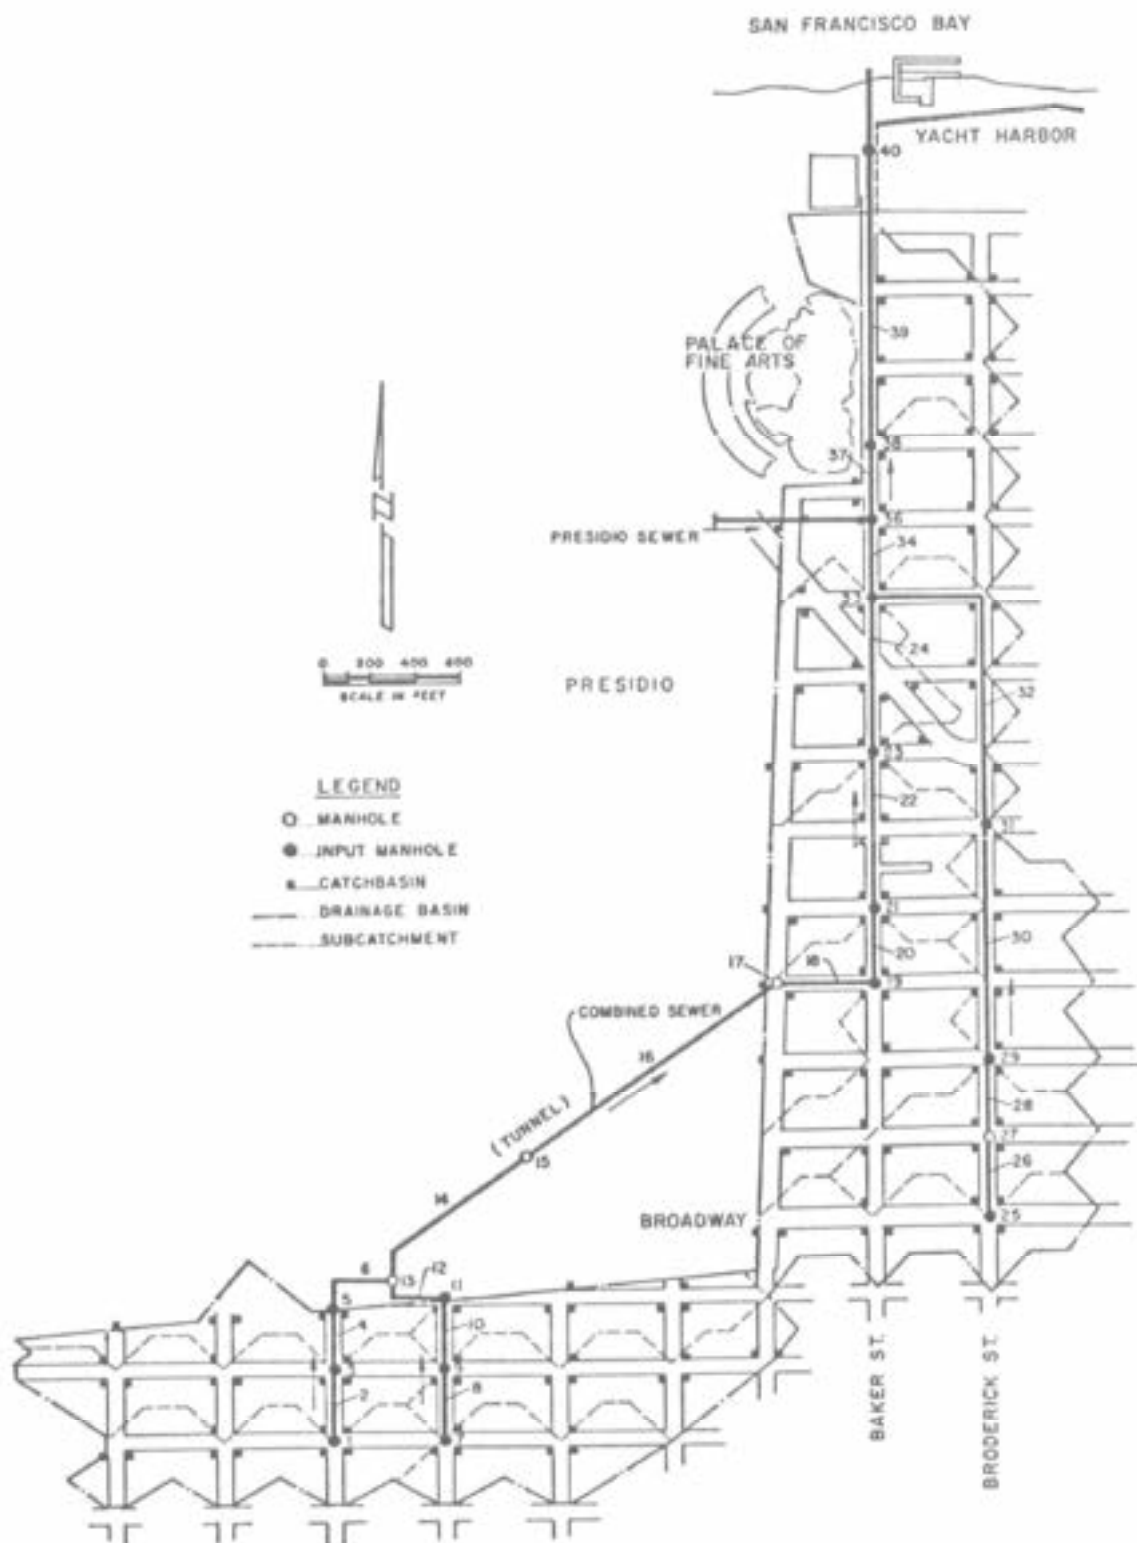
PLAN OF BAKER STREET SYSTEM
